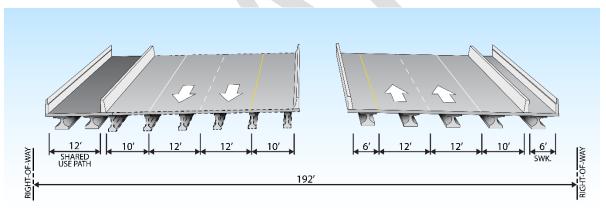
Preferred Alternative Typical Section Hillsbororugh River Bridge
